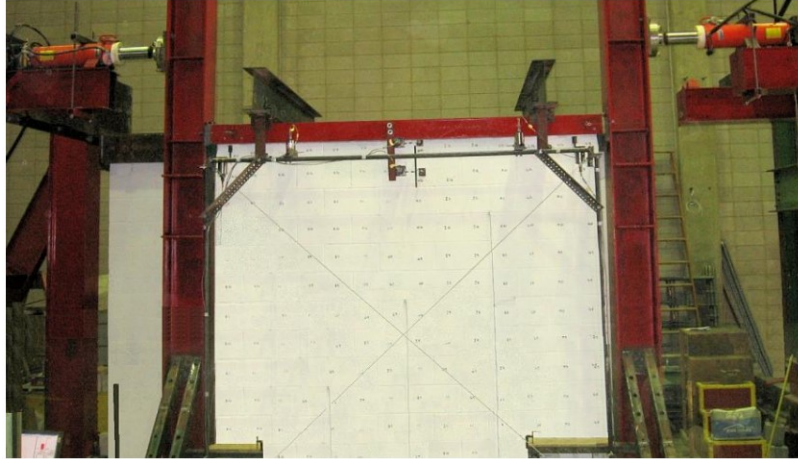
Test setup by Baenziger and Porter (2011)
